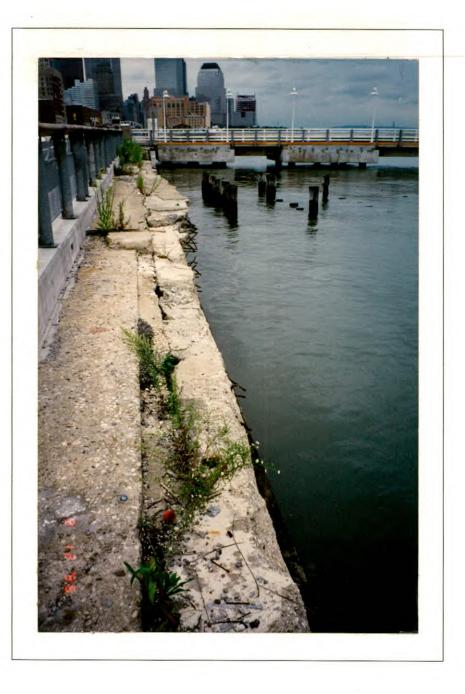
View east of granite bulkhead at Vestry Street with outfall, concrete replacement coping, and new railing Type II.A December 1996
